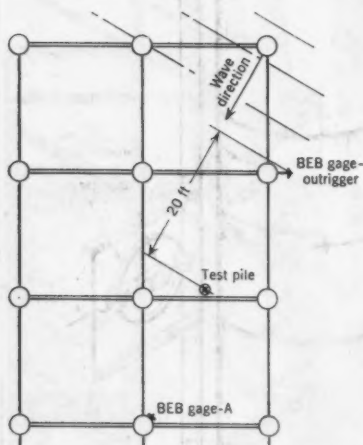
PLAN VIEW OF TEST SECTION OF PIER
